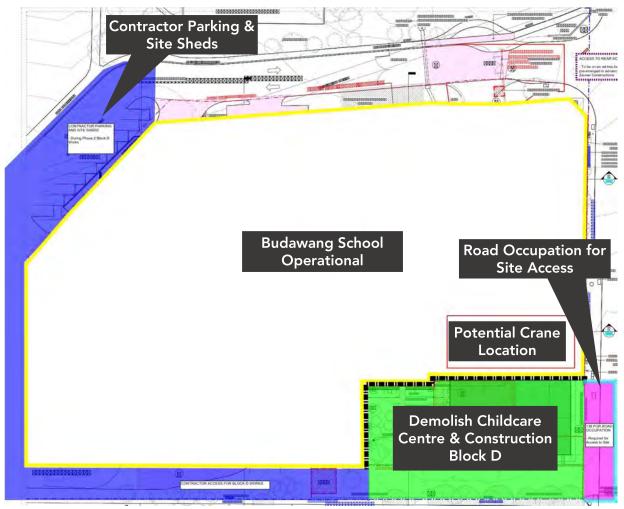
Concept Stage 2 Block D Works Staging Plan (Source: Zauner Construction)
